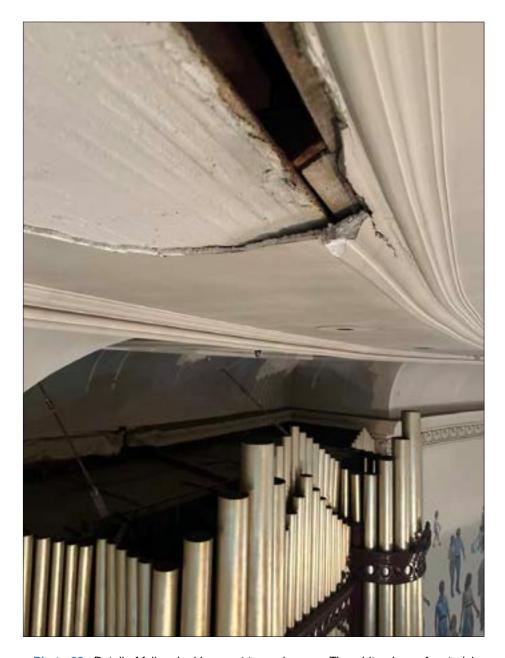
Detail of failure looking west toward organ. The white plane of material represents a flow coat of adhesive applied when the high-hat light fixtures were installed, likely because cracking was evident in the area of the intervention.
